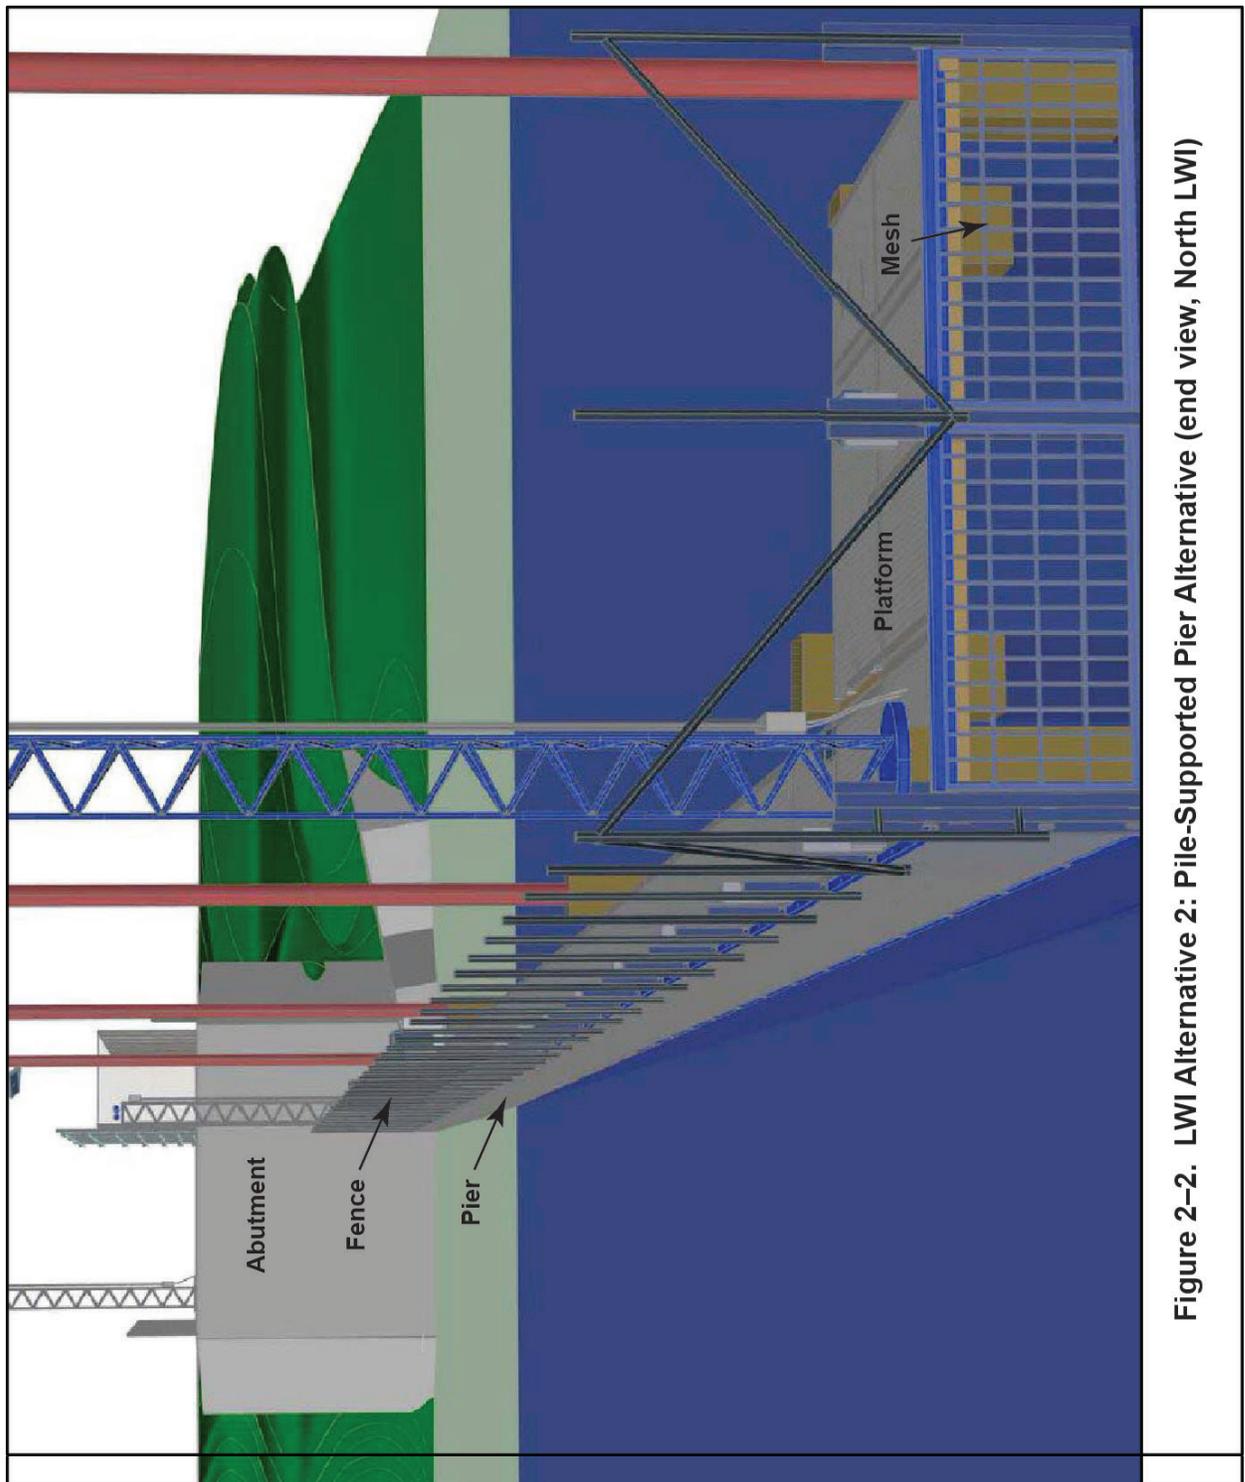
LWI Alternative 2: Pile-Supported Pier Alternative (end view, North LWI)
